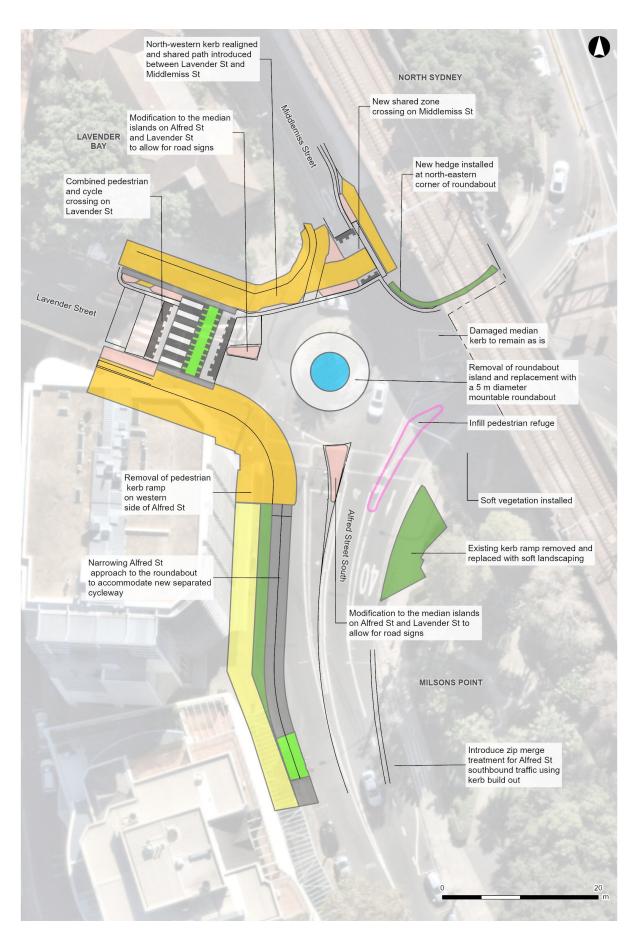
Proposed adjustments to the Lavender Street roundabout
